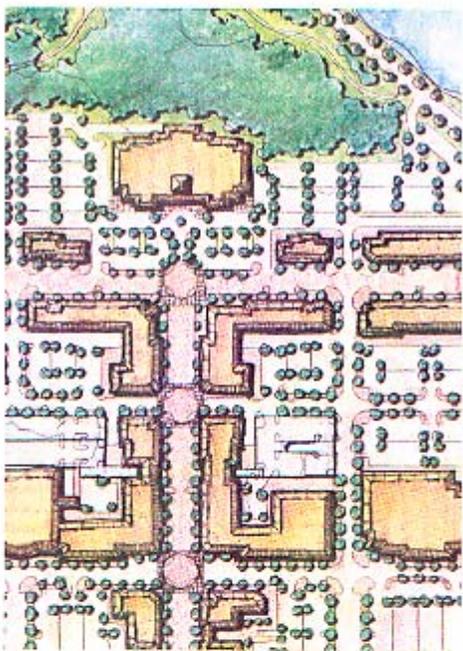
Buildings oriented about primary and secondary streets with parking in rear.
